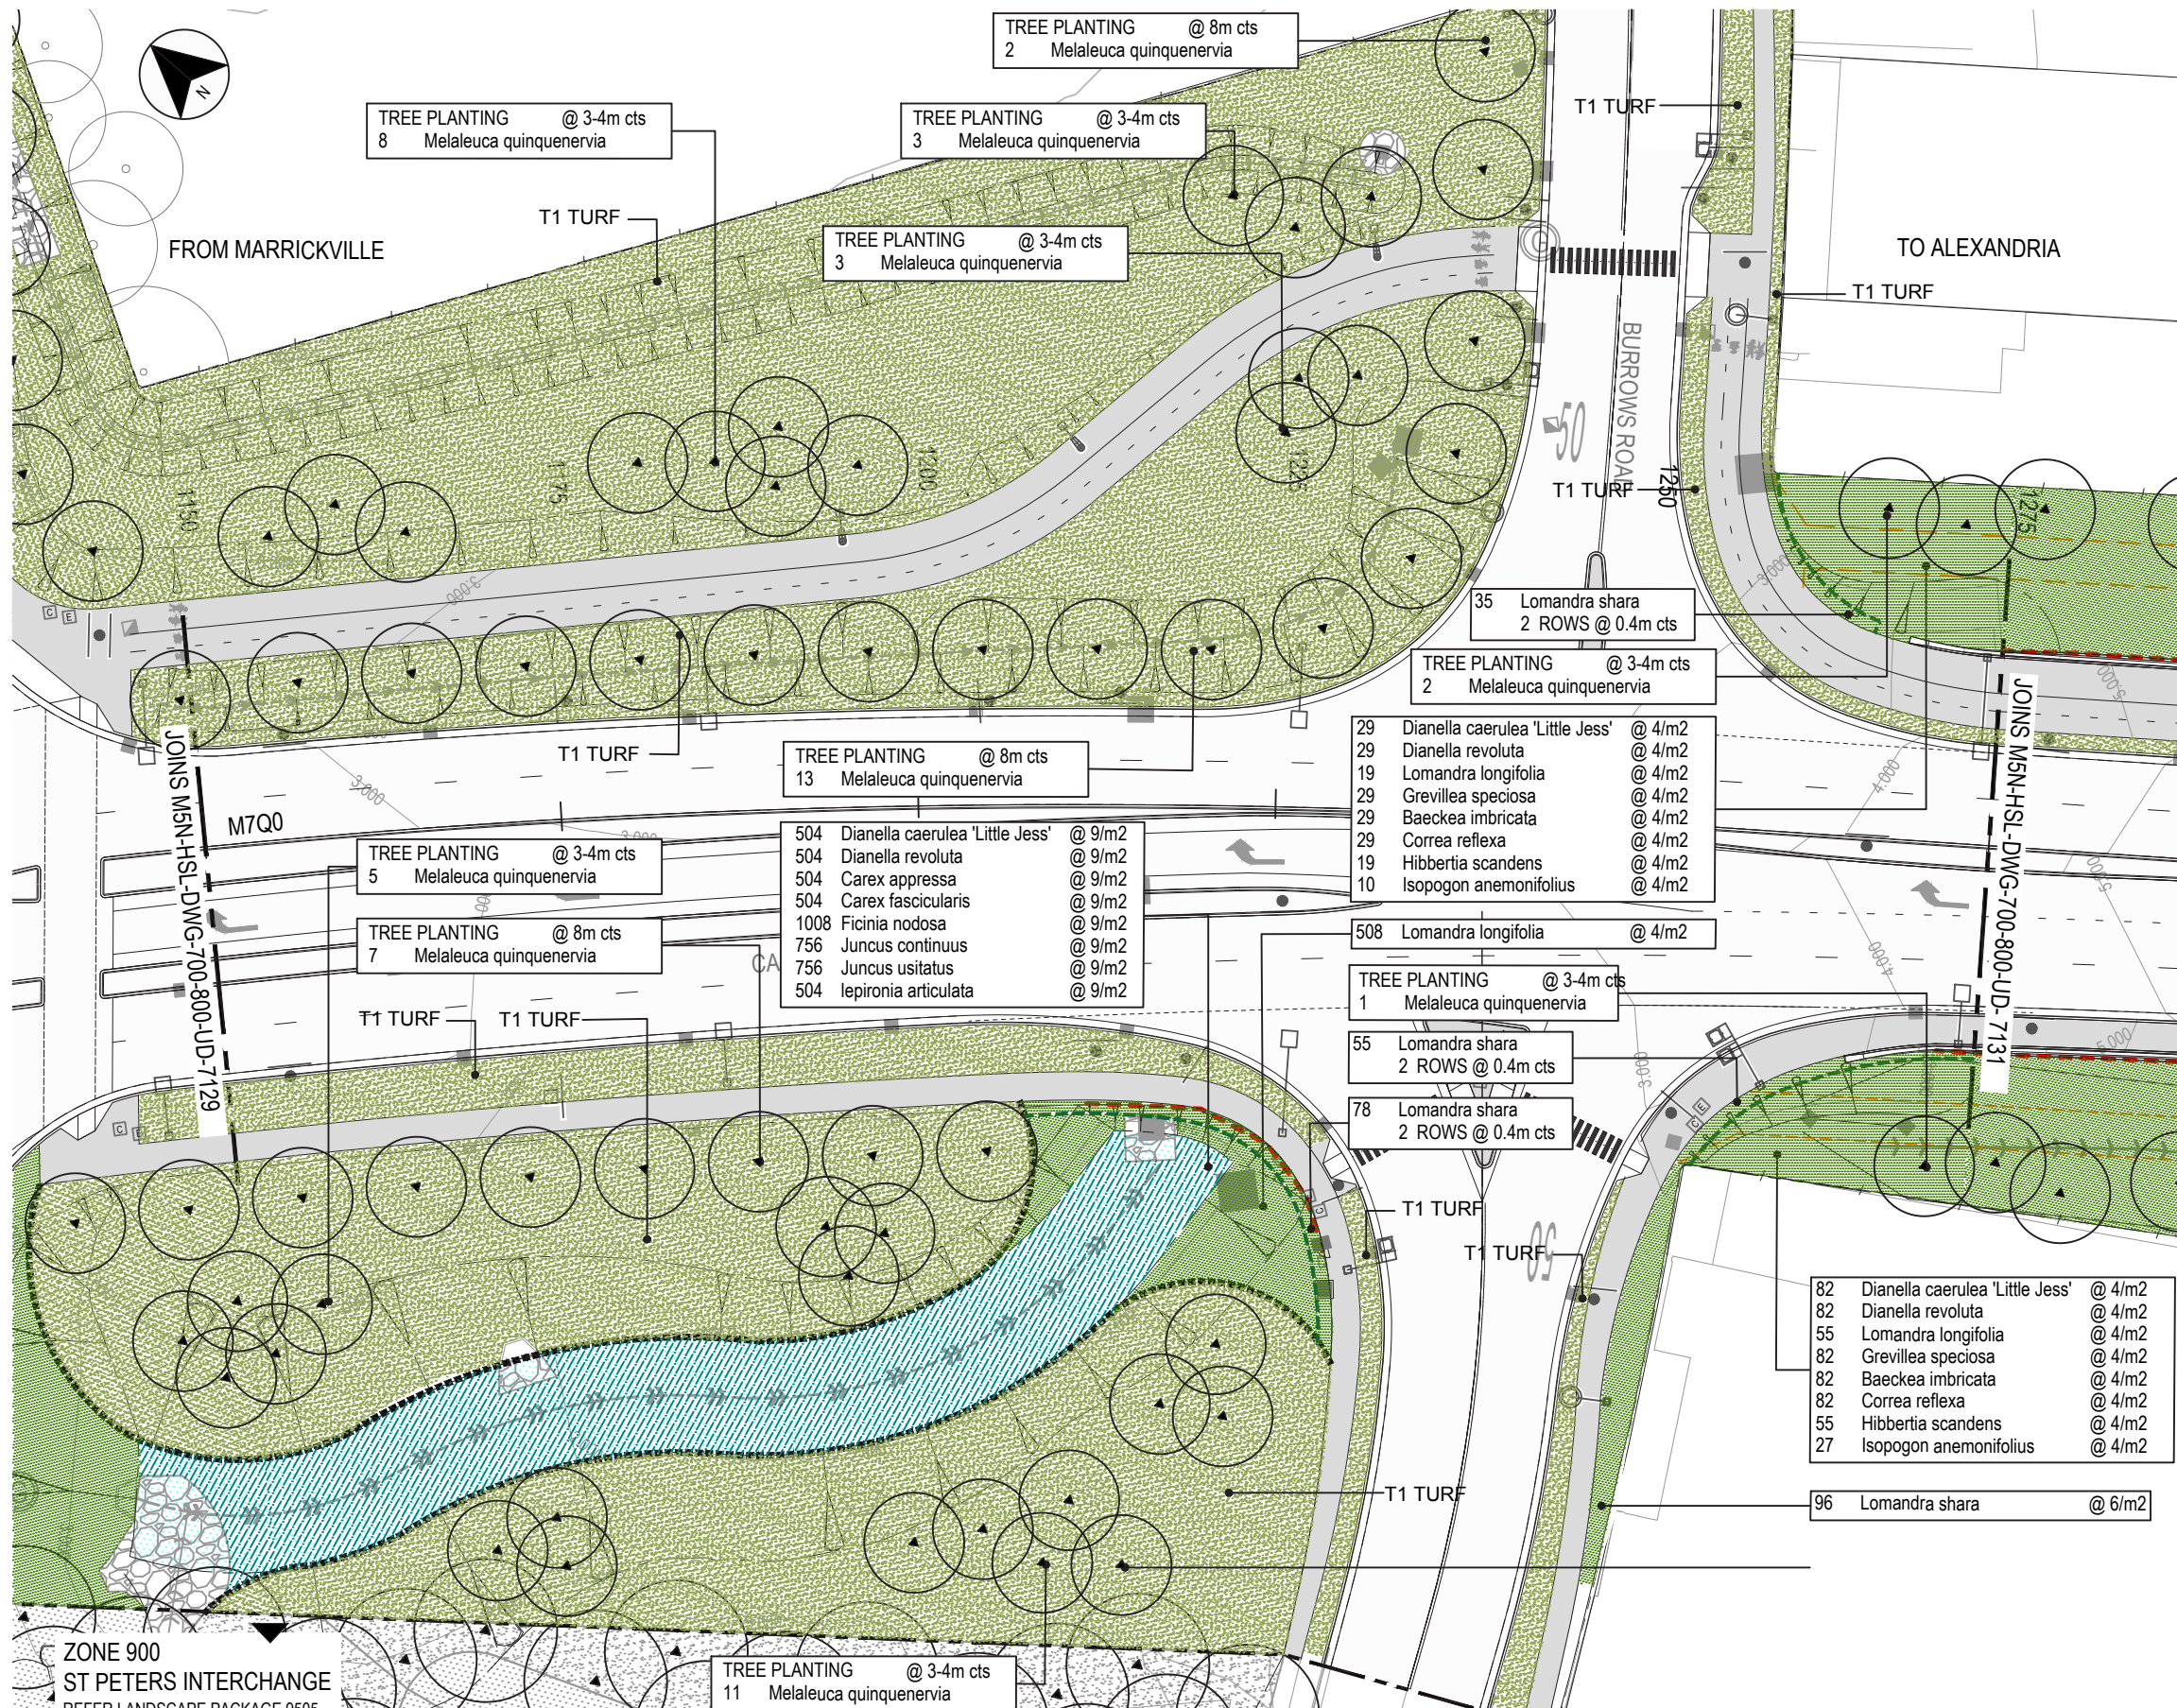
Campbell Street Green Link - Landscape Plans - Sheet 9 of 10
